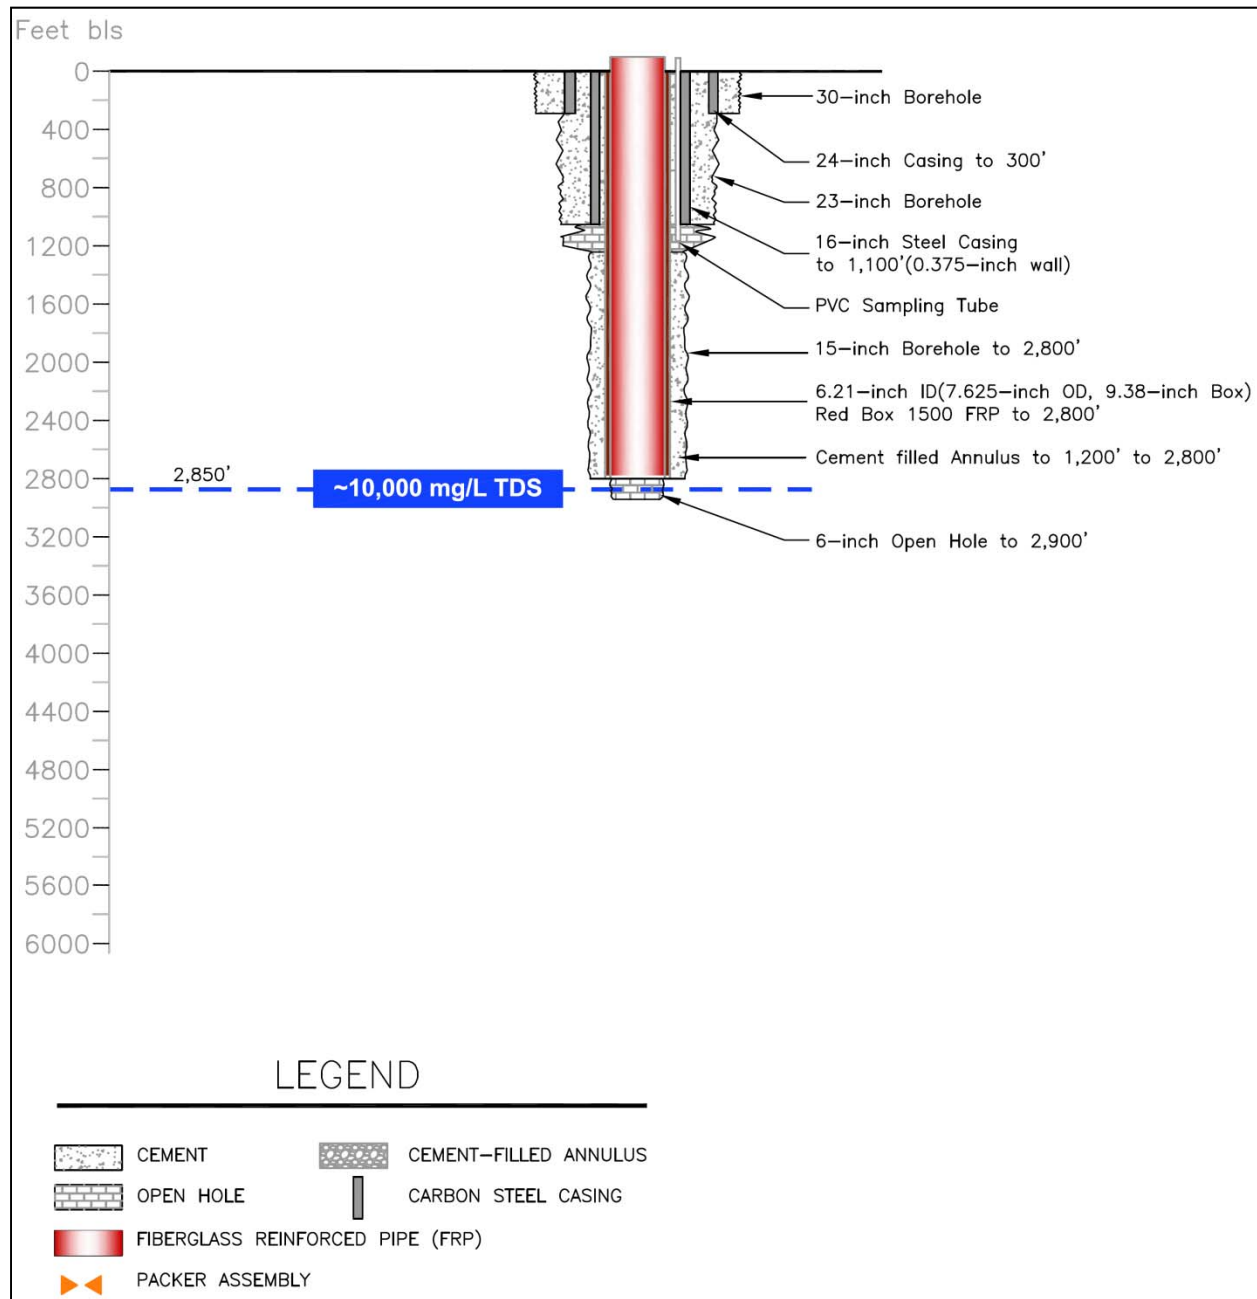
Dual Zone Monitoring Well DZMW-2 Design Details
